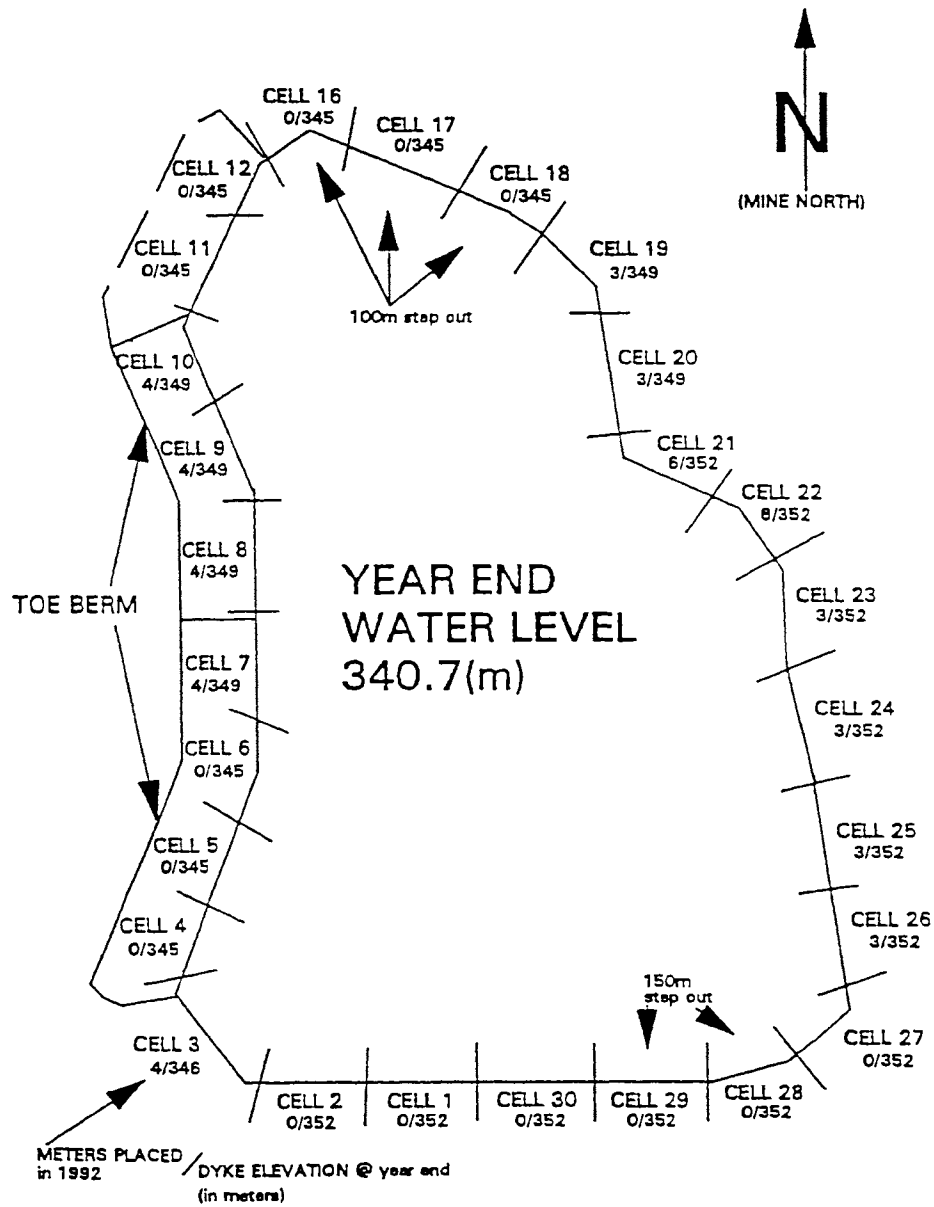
Site plan of Mildred Lake Settling Basin at Syncrude Canada Ltd. site.
